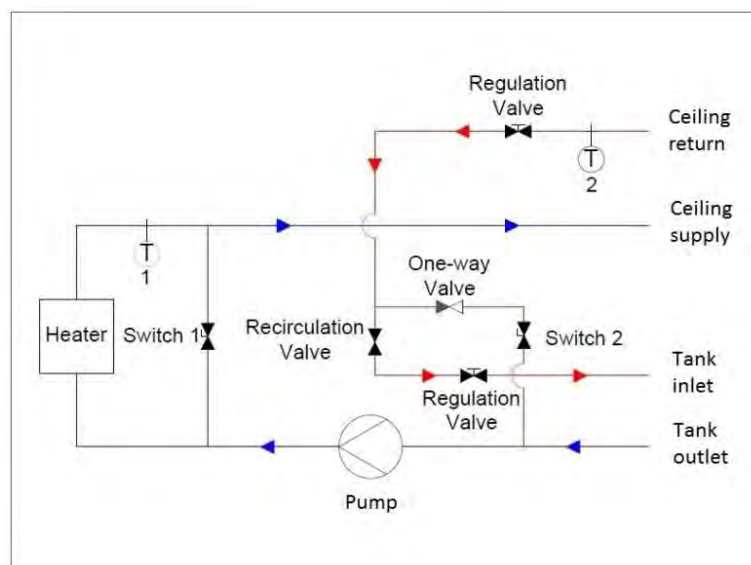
Hydraulic scheme of the ceiling water supply system
